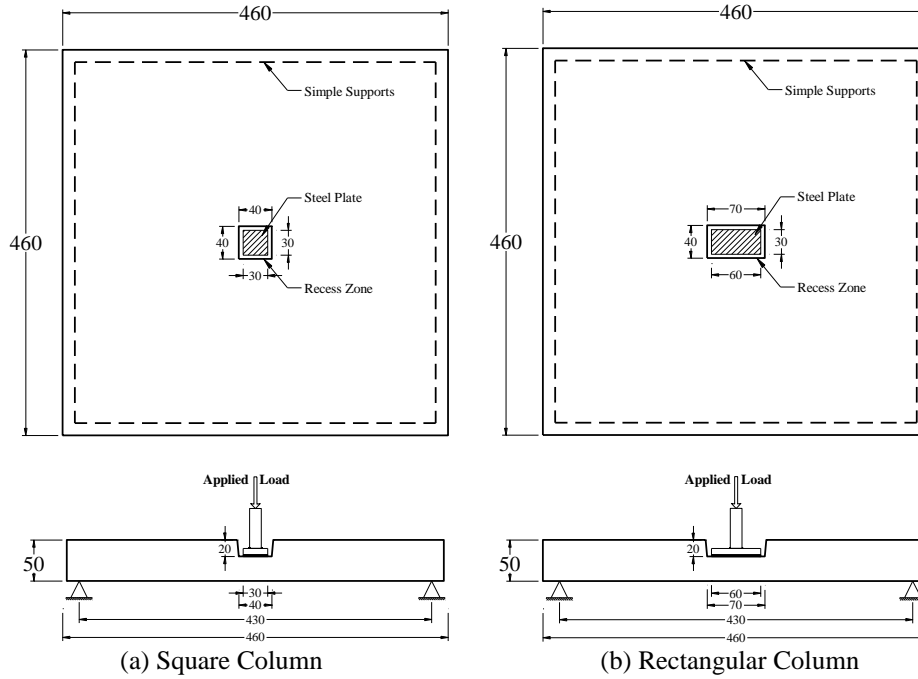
Details of the punching slabs under test [All dimensions in (mm)]
